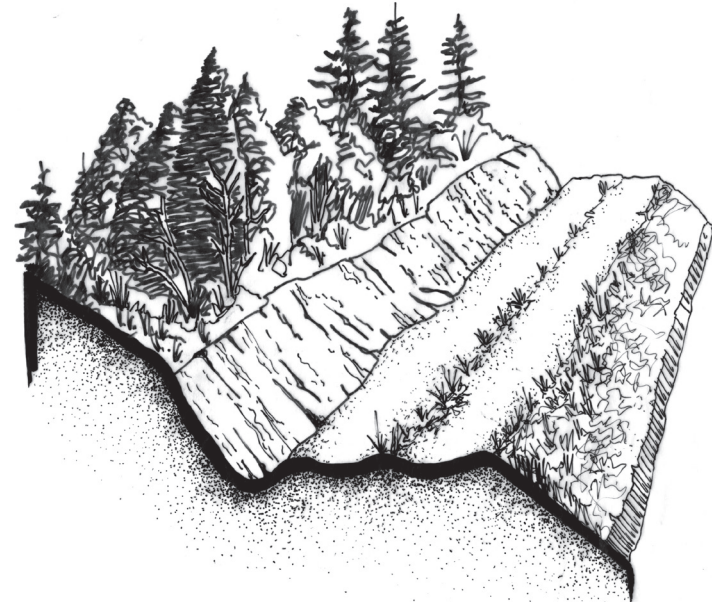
A two-track dirt road similar to the construction road in the restoration area.
